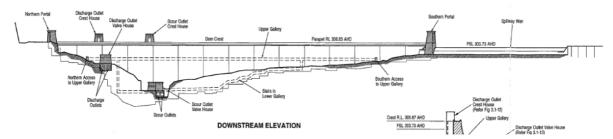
Elevation of the Cordeaux Dam Wall (Source: WaterNSW, 2015b)
